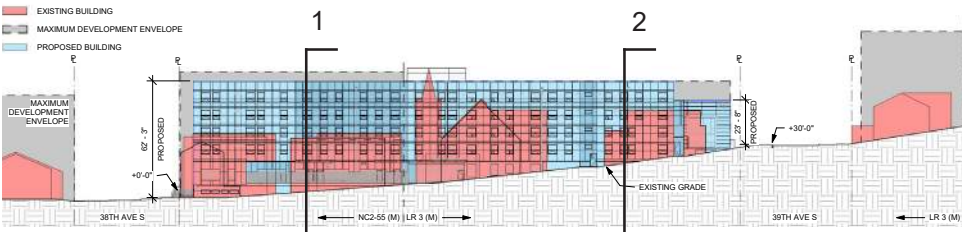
Elevation showing existing structures, maximum development envelope and proposed building mass.
